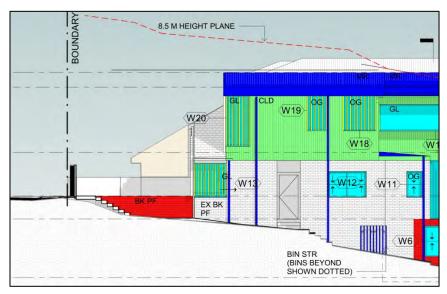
Proposed west elevation of the semi-detached dwelling showing the extent of the front demolition compared to 10 Narelle Street outlined behind the new works and the hardstand car space shown in red.
